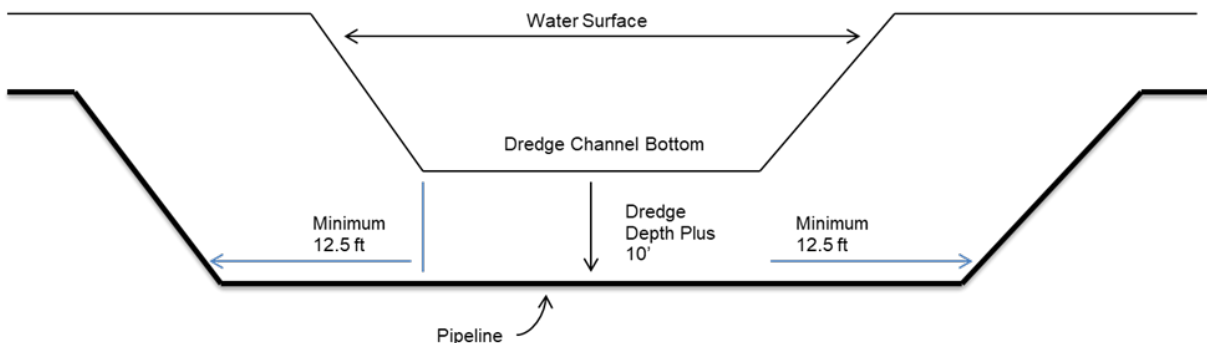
Figure B. Typical Schematic for Shallow Draft Channels demonstrating pipeline placement requirements.
